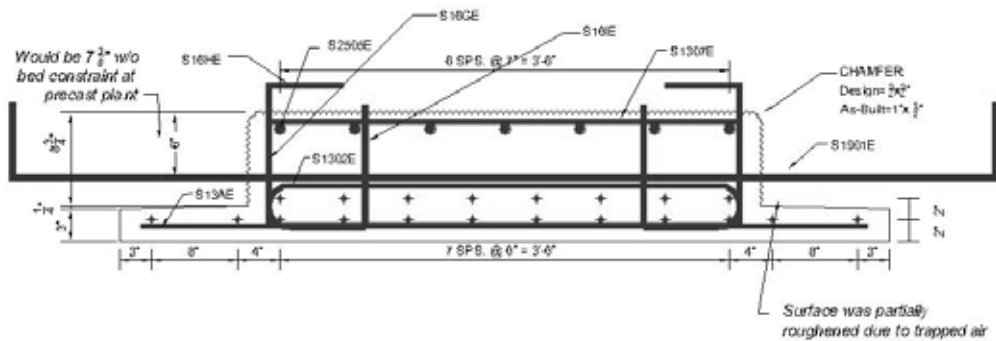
As-built cross section and reinforcement details of the west end Beam 1S
